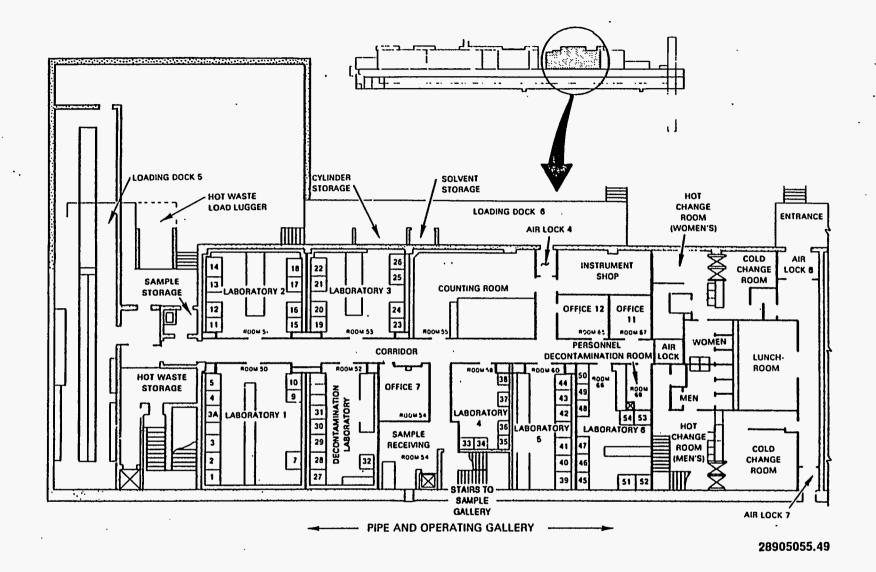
202-A Building Analytical Laboratory--Plan View.
